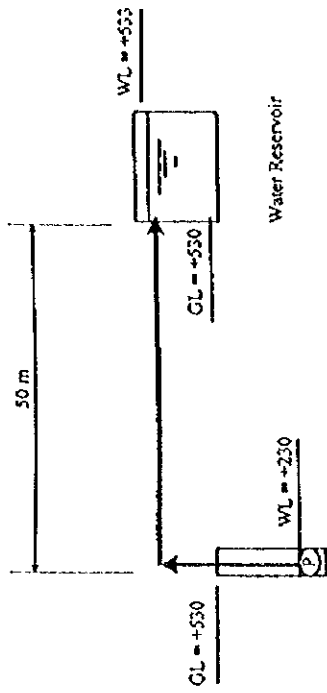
(2) Water Levels of Facilities (Plan 2)
